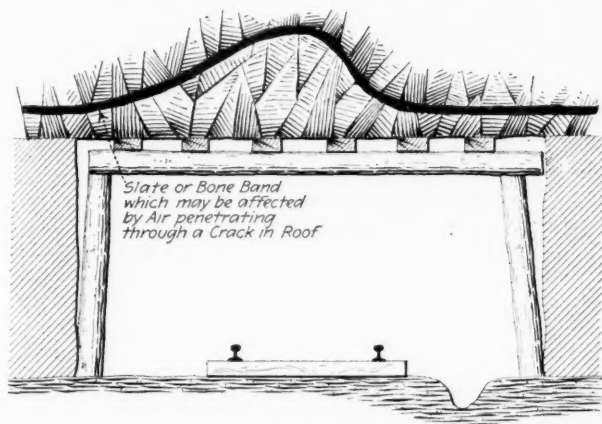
EXAMPLE OF ROOF REQUIRING TIMBER
